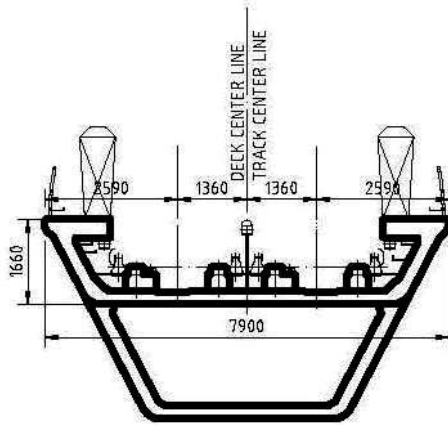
FCM typical section showing continuity of track section outline, while bottom U-box ensures structural integrity
